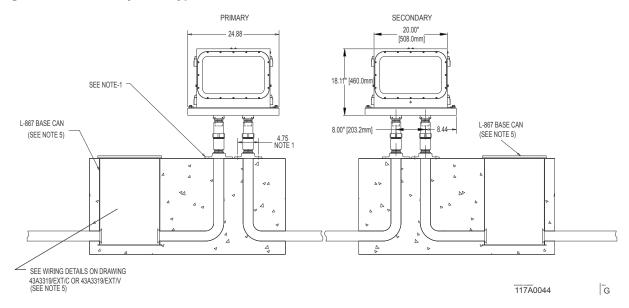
LED REIL, Style A/E Typical Installation Details 117A0044
